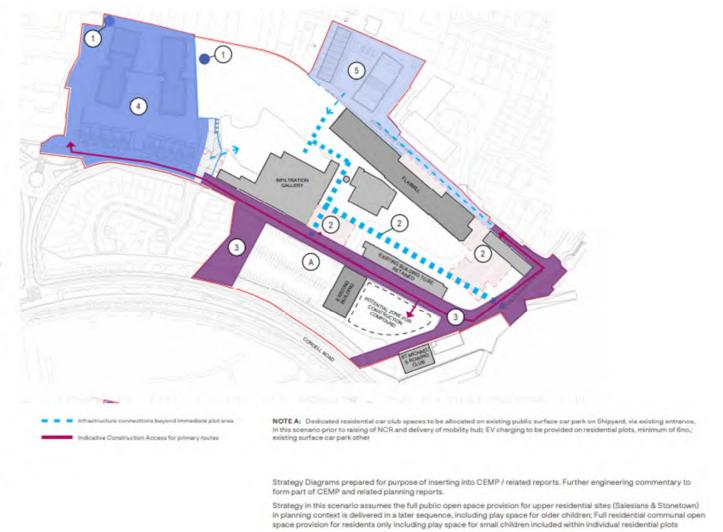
Proposed Preliminary Phasing Plan – Stages 1 to 5 (refer also to Table 2-2) (prior to raising of North Circular Road and implementation of flood protection measures)
